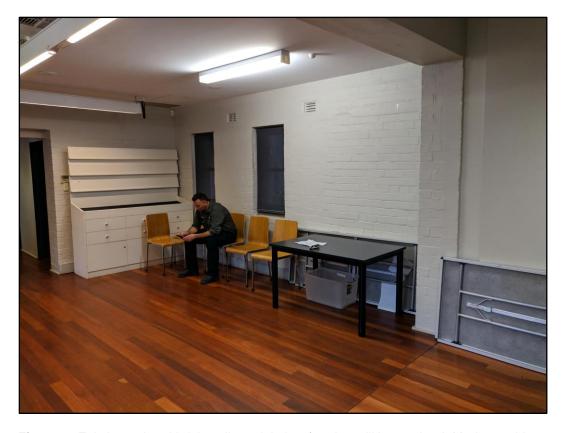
Existing painted brick walls and timber framing will be retained. Modern cabinetry and skirting containing wires will be removed.
